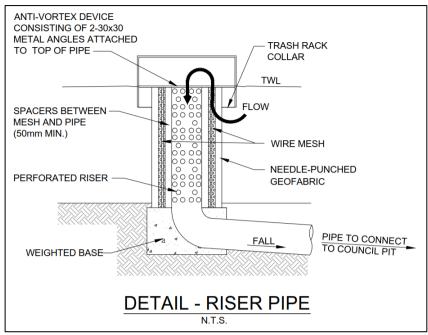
Pump Out Pit Outlet Pipe Detail
